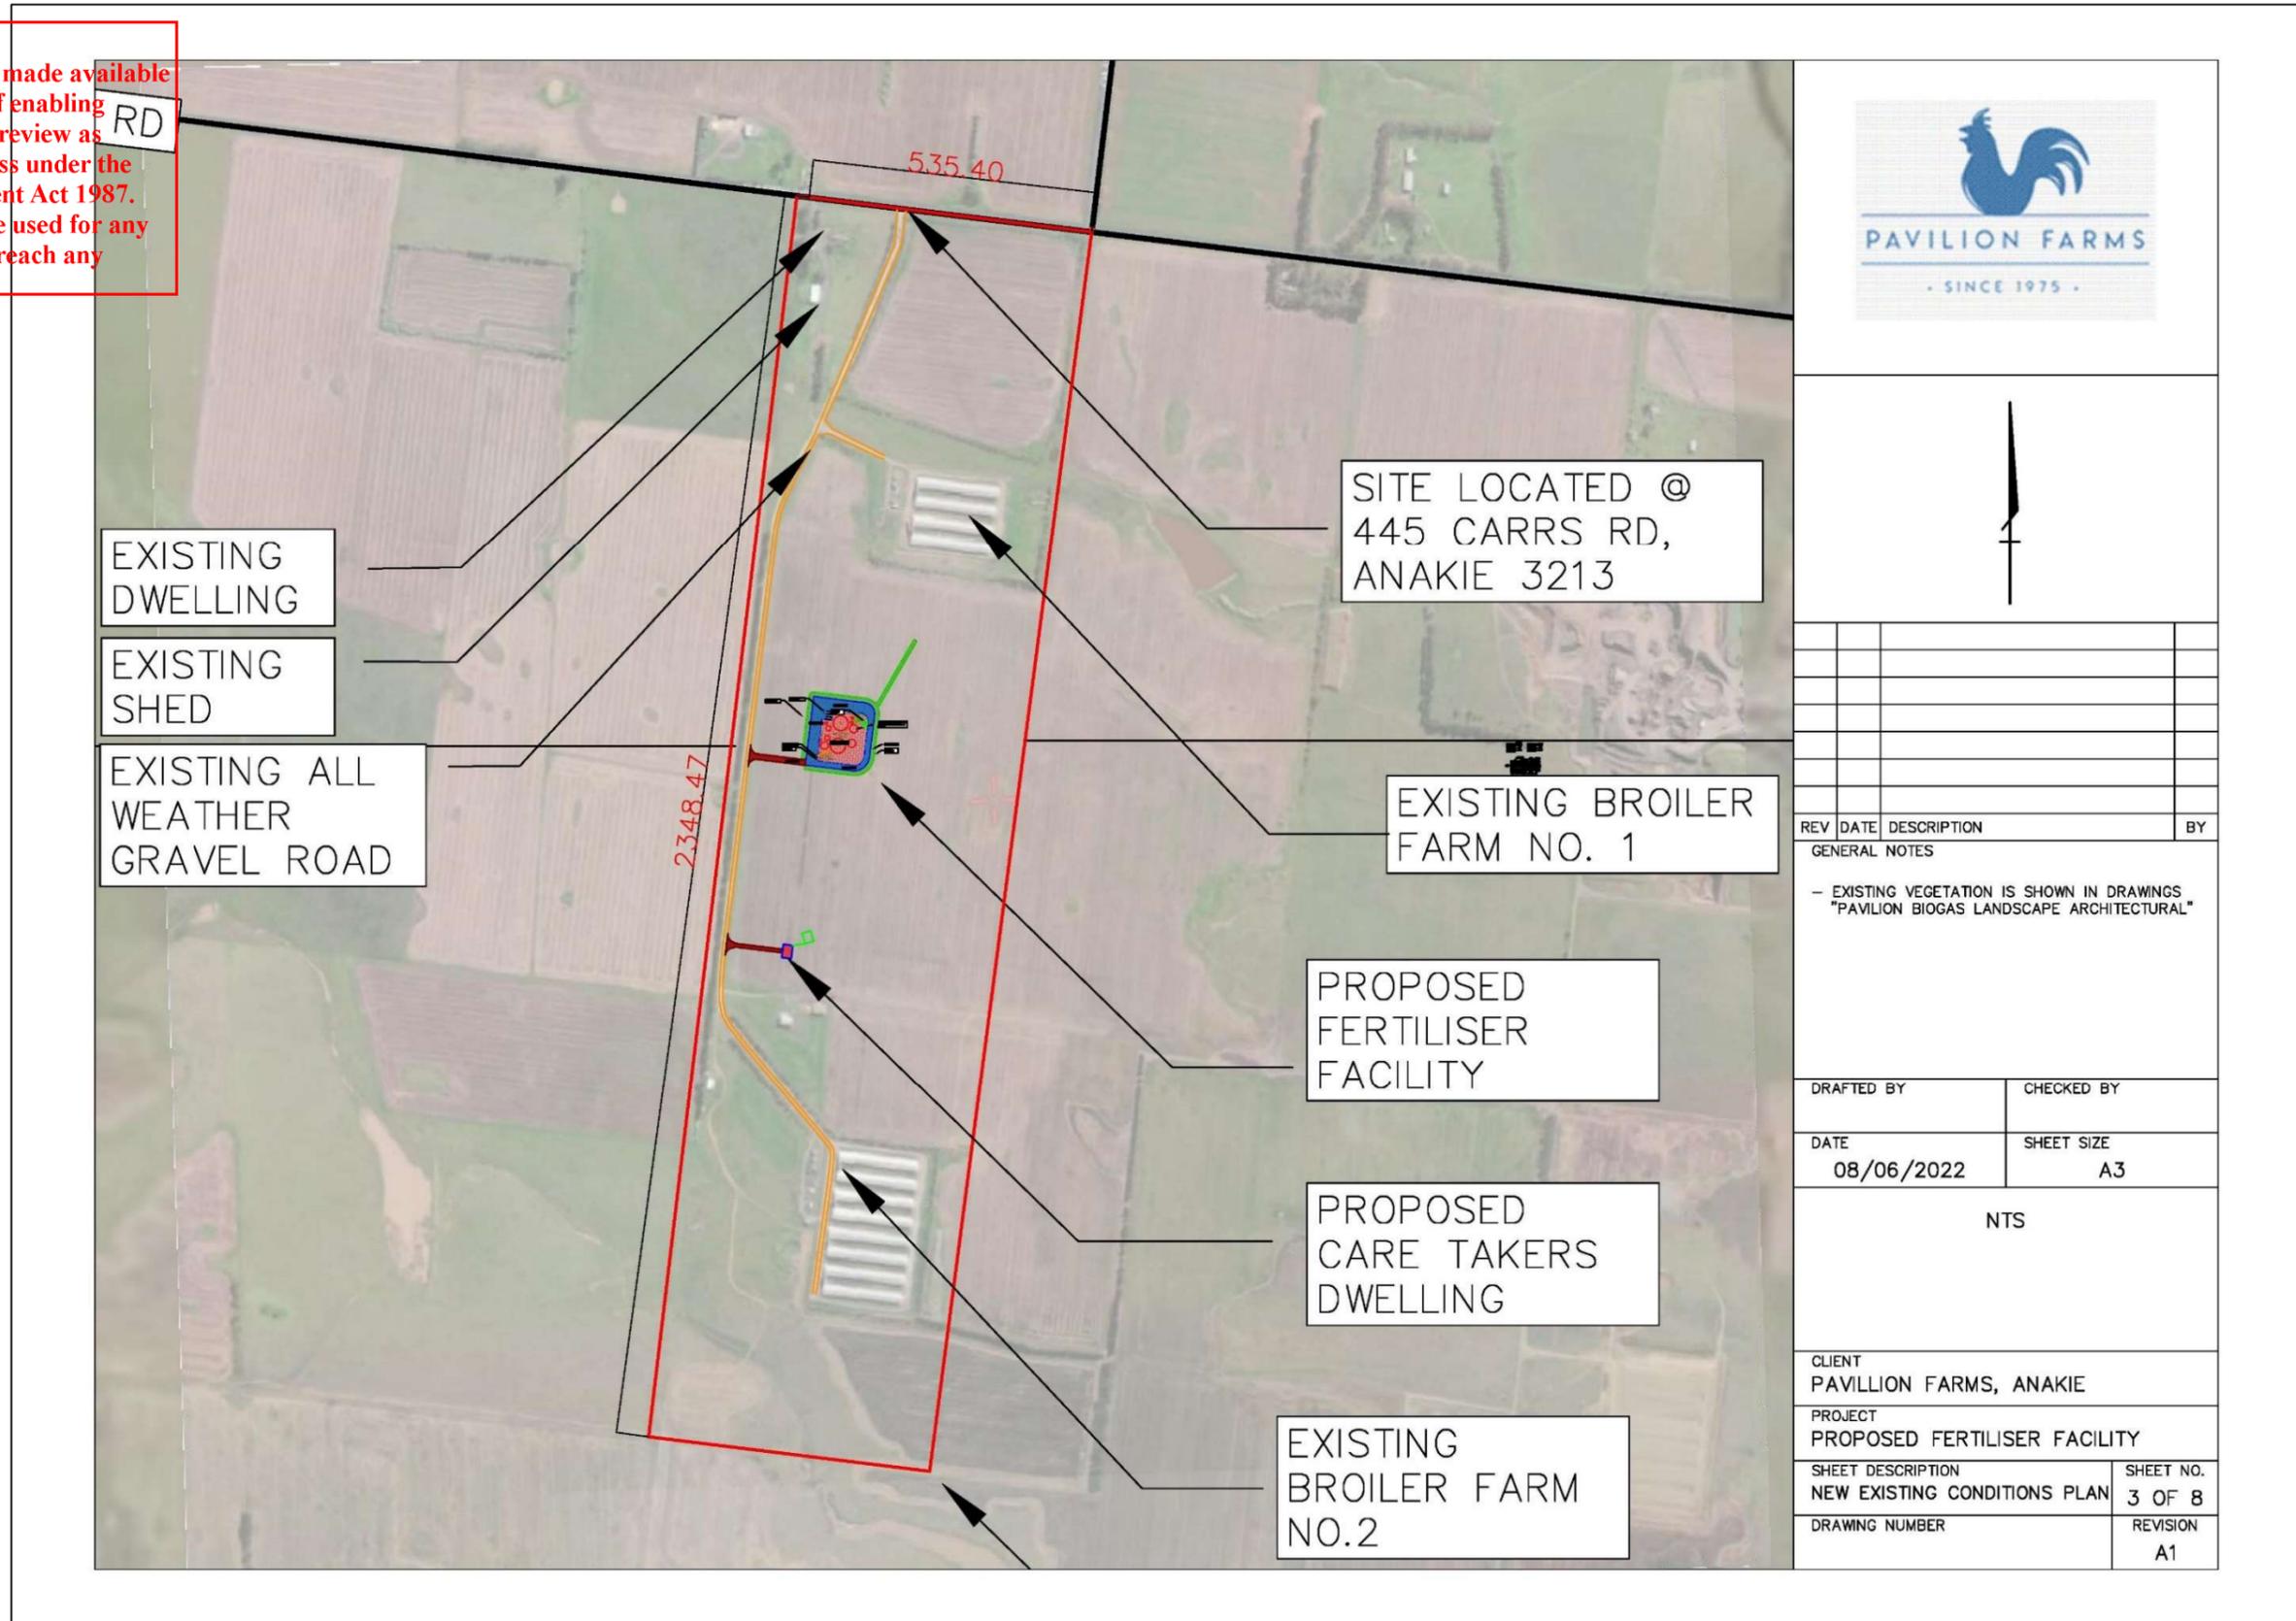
Locality Plan of the Proposed Fertiliser Facility
